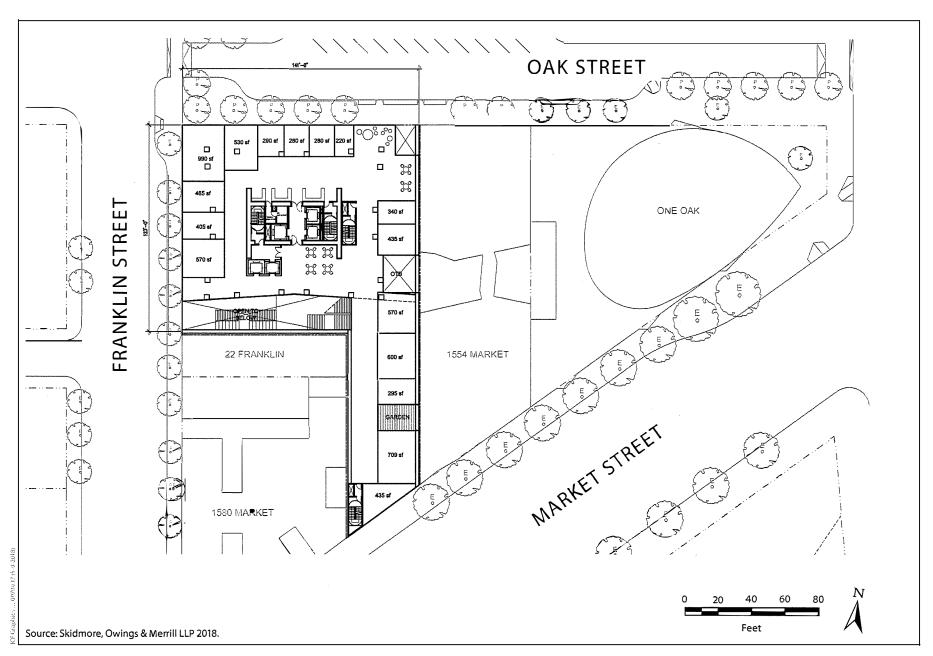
98 Franklin Street Project – Proposed 3rd Level Floor Plan
